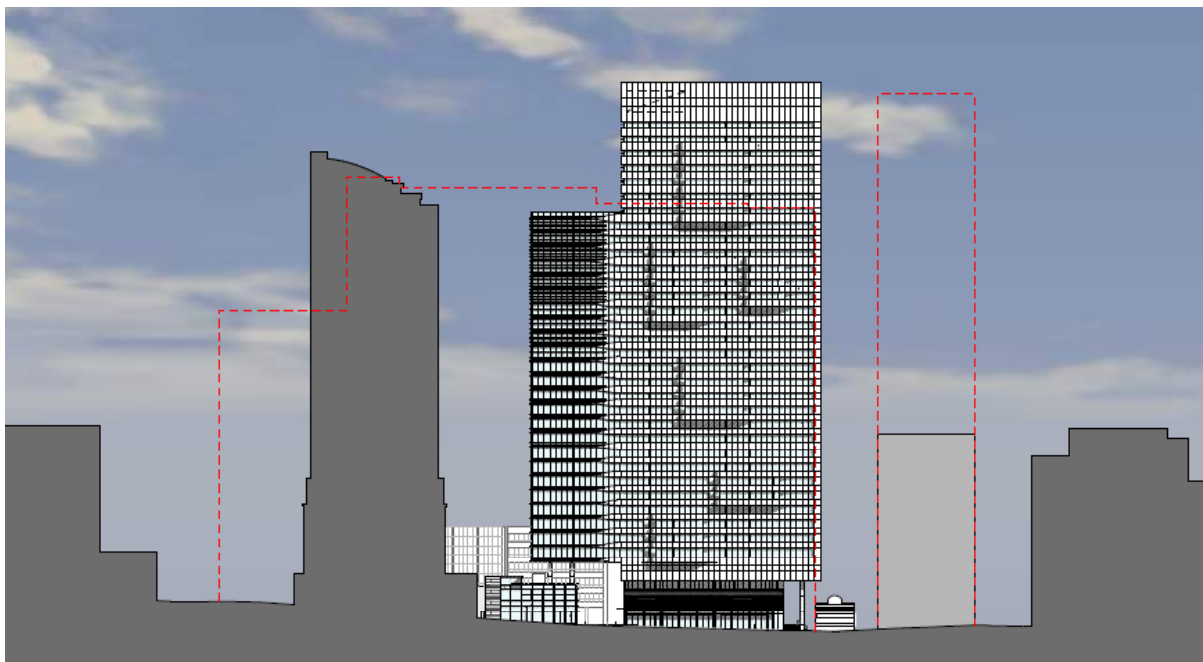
Western elevation of the proposed commercial tower (draft LEP No 28 envelopes shown in red)
